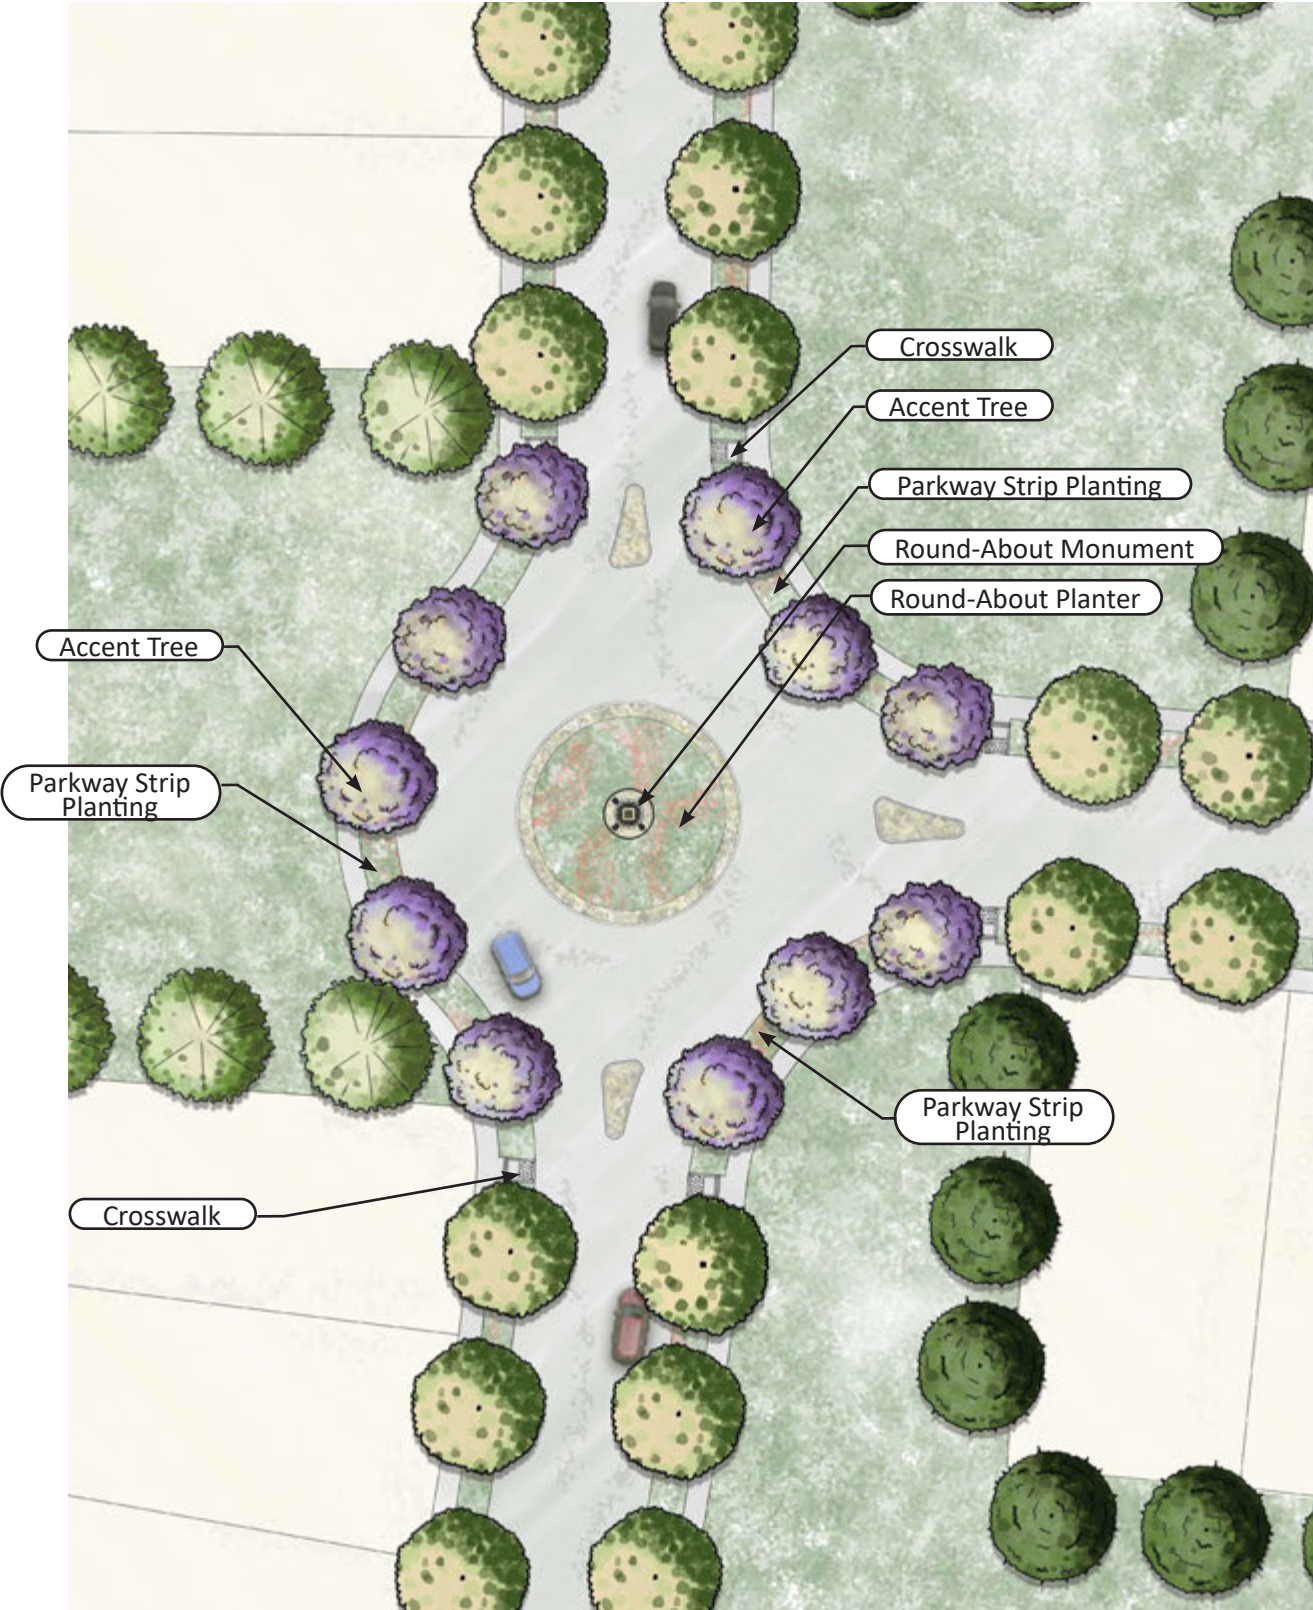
B STREET AND N STREET GATEWAY/ENTRY CONCEPT PLAN
